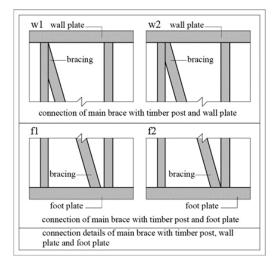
Connection detail of braces with timber post, wall and foot plate (prepared by the author)
